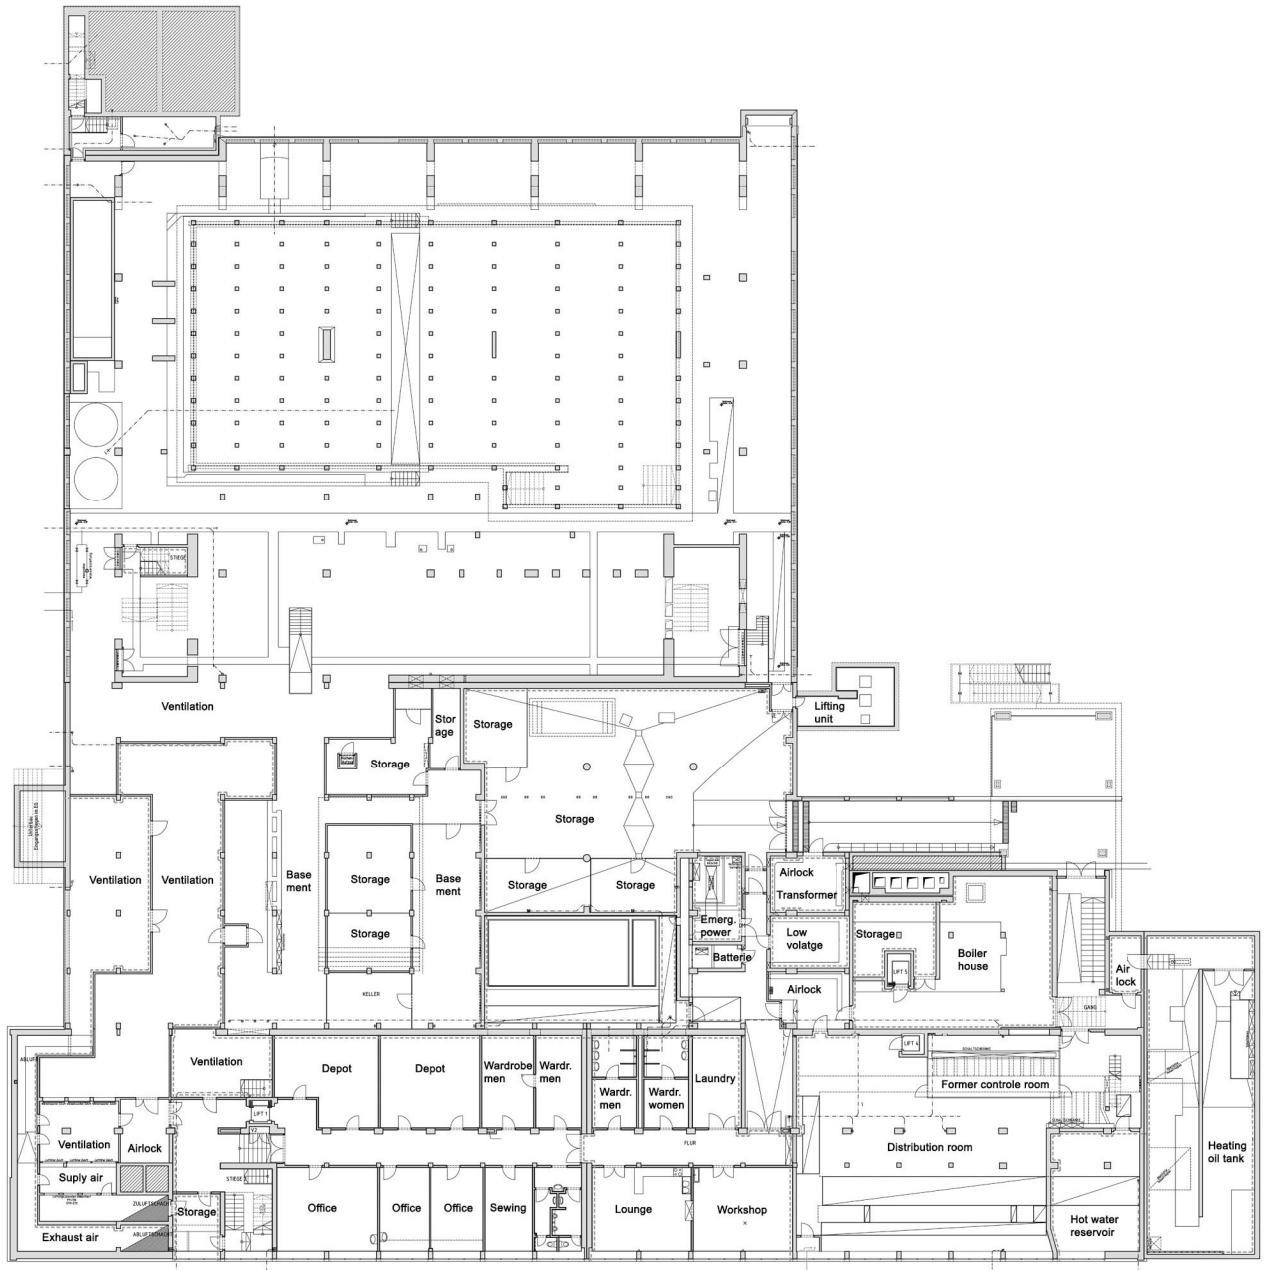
Basement plan Floridsdorfer swimming hall 1:500 (source: MA 44, 2016/17)
